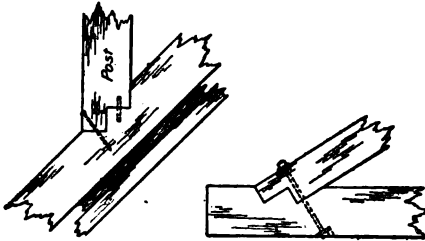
Single Step Joint at Middle of Roof Truss.
